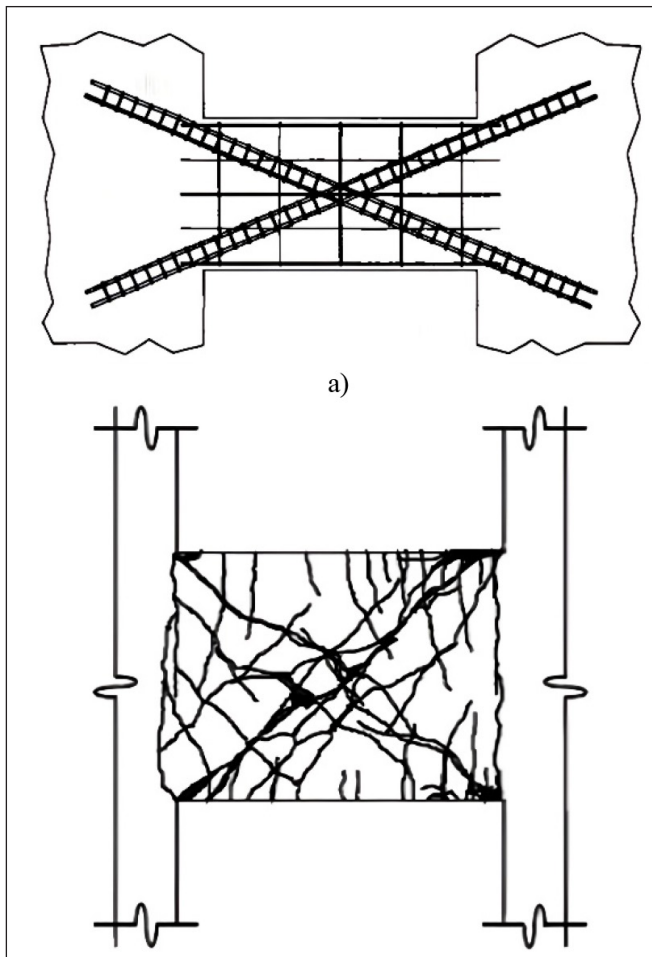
Diagonal Reinforcing Coupling Beam. a) Reinforcing Layout (Boivin, 2006), b) General Crack Pattern (Harries, 2001)
